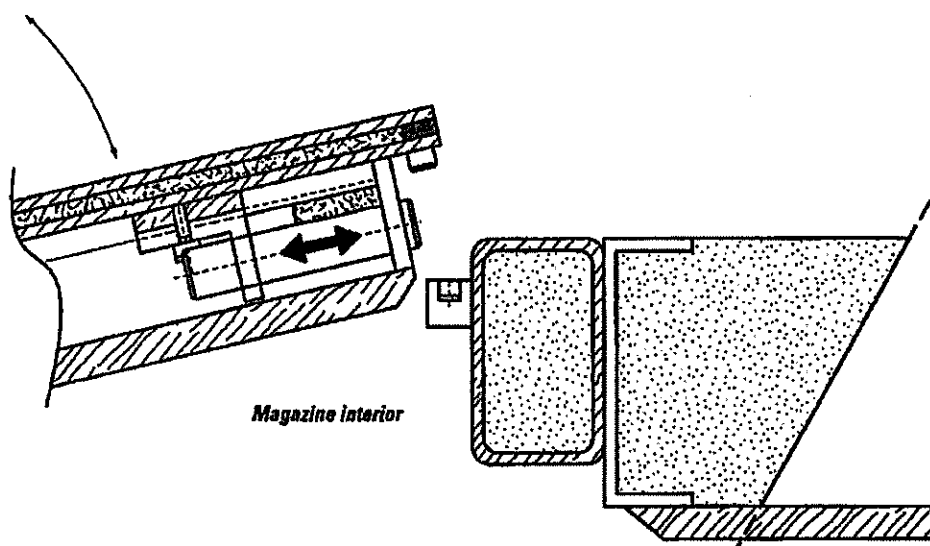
Typical Types 1 and 4 magazine door and frame in open position.
